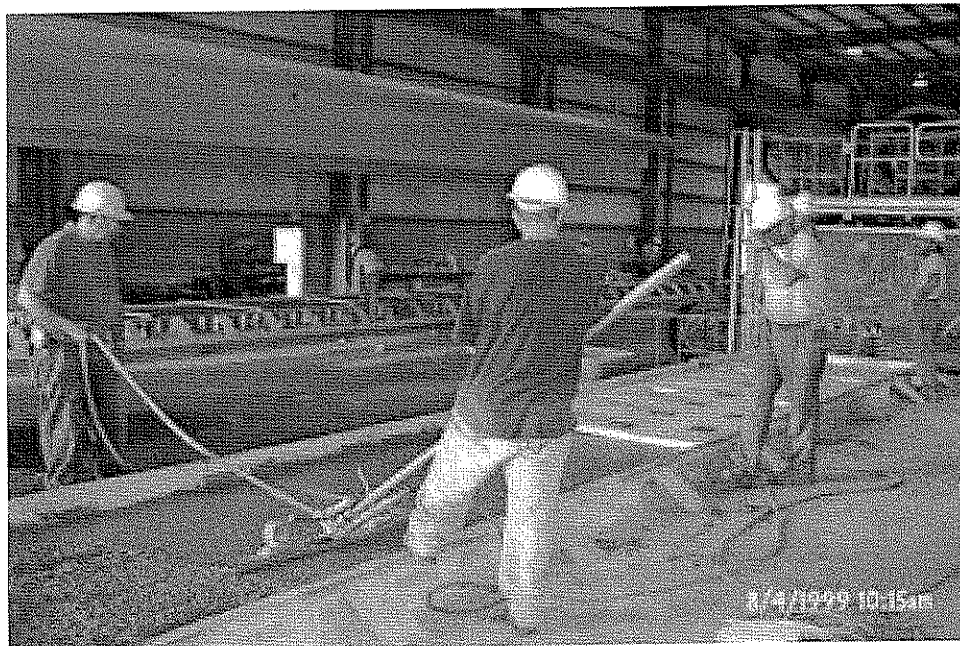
Placement of the face wythe concrete and the insulation board.
